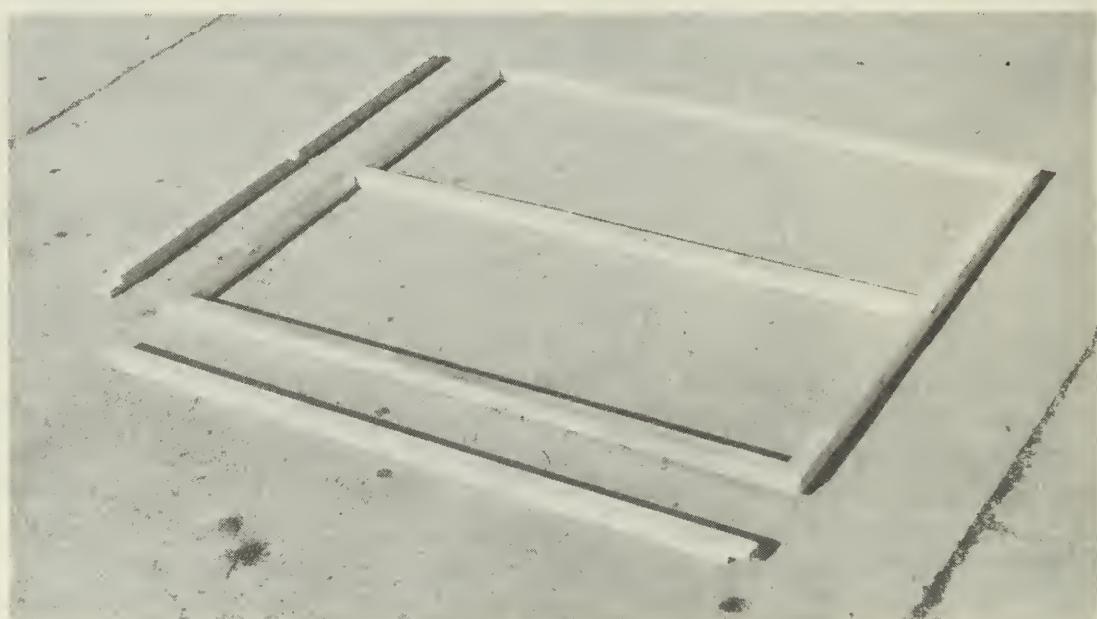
Pieces of wood 38 mm x 38 mm in position, and an assembled panel.
